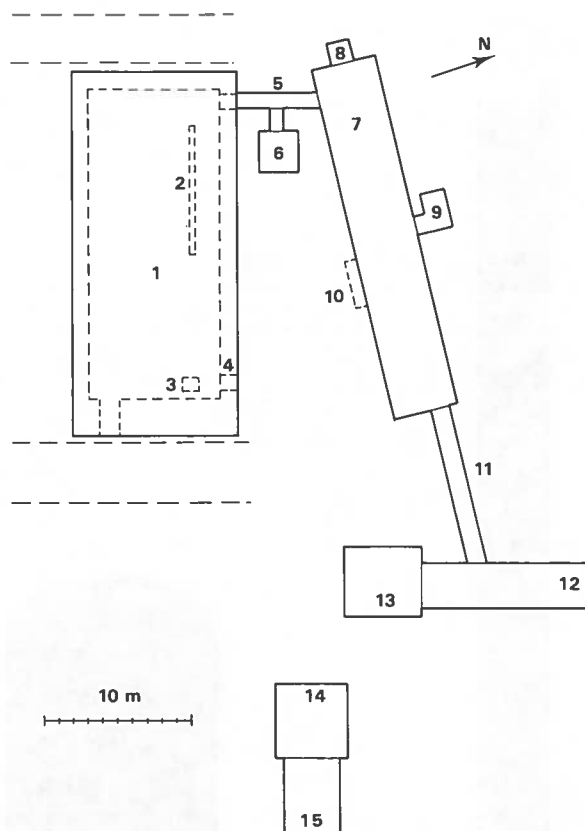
Dye-3 drill camp. The camp consists of the drill shelter, a science trench and a core storage trench. Tunnels connect the drill pit and the trenches. 1. drill pit, 2. 6 m deep pit, 3. winch, 4. pump station, 5. tunnel, 6. cold cave, 7. science trench, 8. emergency escape hatch, 9. surface conductivity cave, 10. dust room, 11. tunnel, 12. core storage trench, 13. weatherport entrance, 14. weatherport, 15. chemical lab-van.
